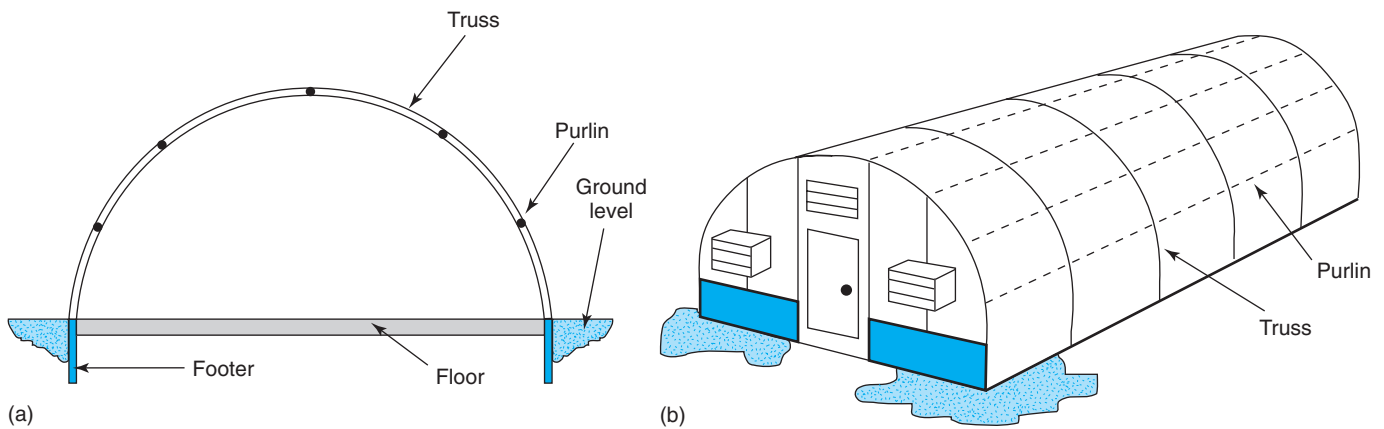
Arched-frame greenhouse structure: (a) end view and (b) general view.
